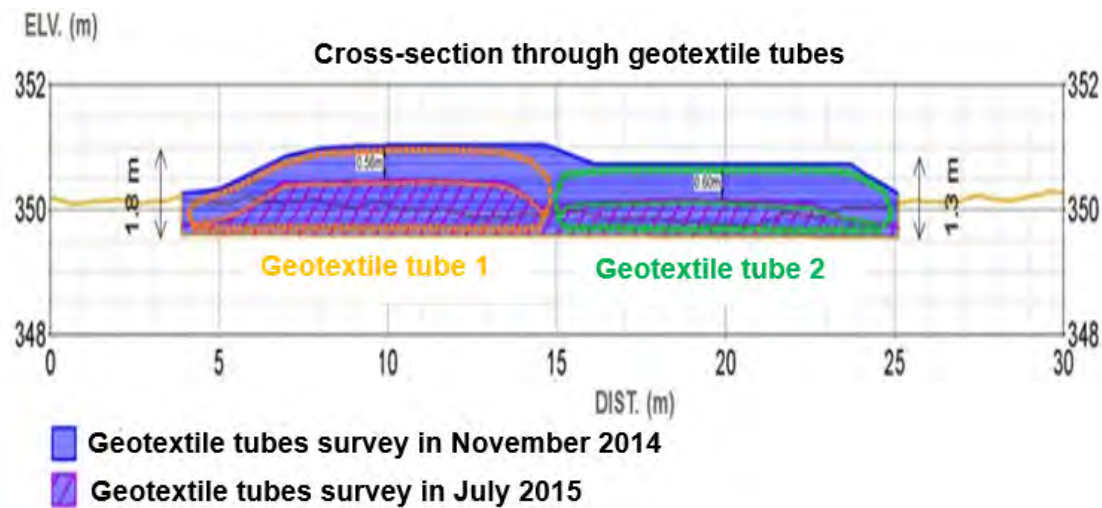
Cross section through the geotextile tubes 1 and 2.
